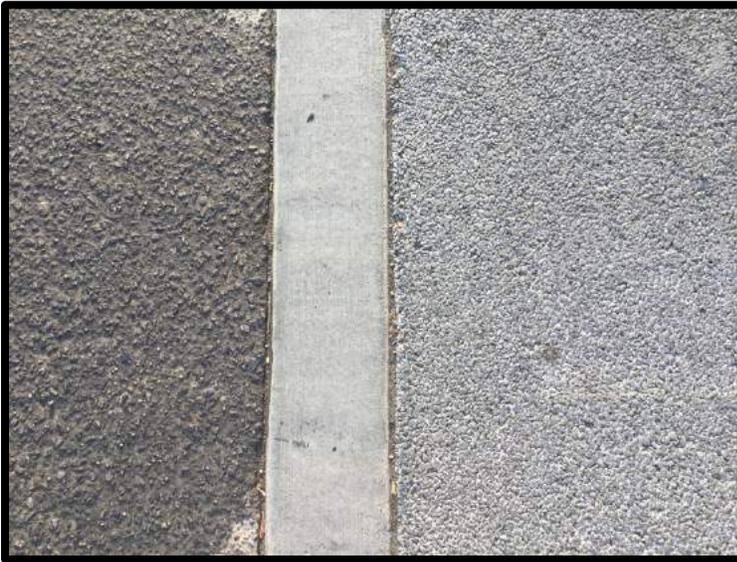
Permeable pavement (on right) can reduce storm water runoff from an urban site. This type of pavement installed in downtown parking lots in Visalia increases ground water recharge as well as reducing the cost of storm water improvements.
